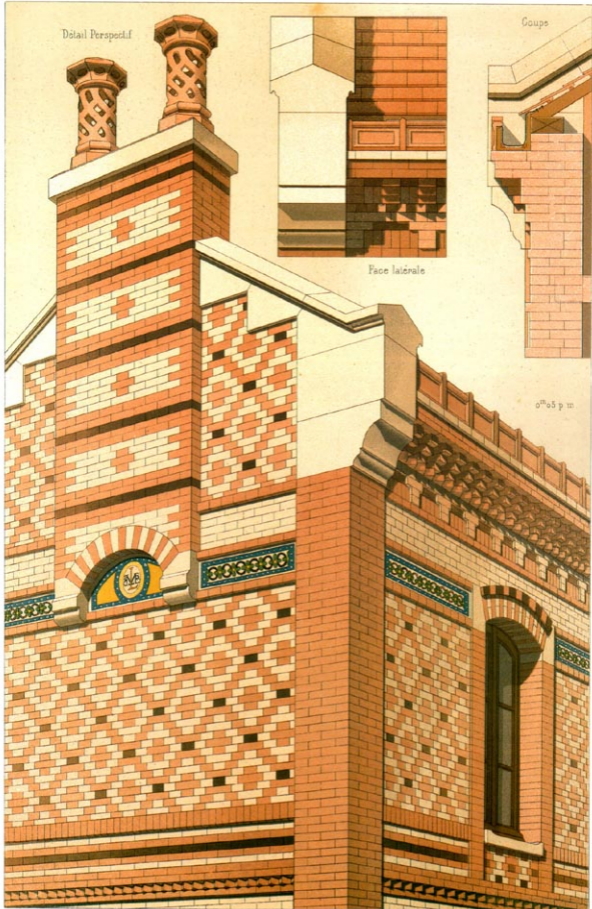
Gardener's house at Bagneux (Paris); architect: Pierre Chabat.
